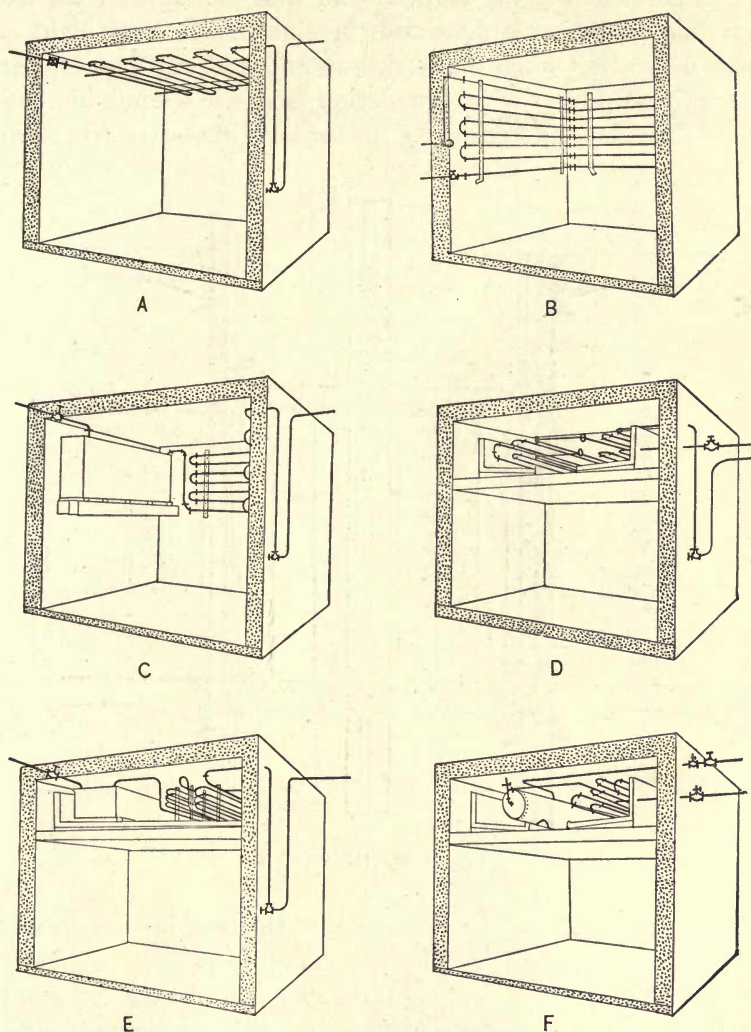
Arrangement of Piping as Shown by Creamery Package Co.
